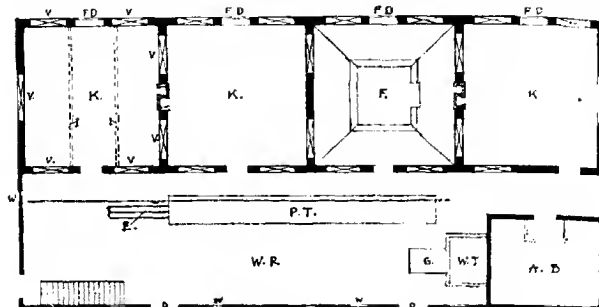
Fig. VI.—Four-kiln Evaporator, Ground Floor Plan.
